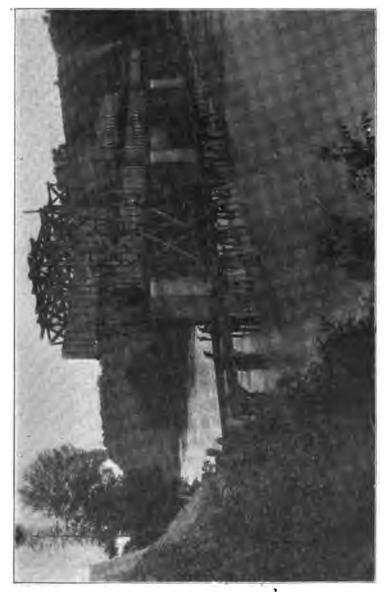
Curwensville Viaduct (N.Y. C. & H. B. R. R.). The 100-foot Girders Being Carried into Place by the Traveler. June, 1904.
